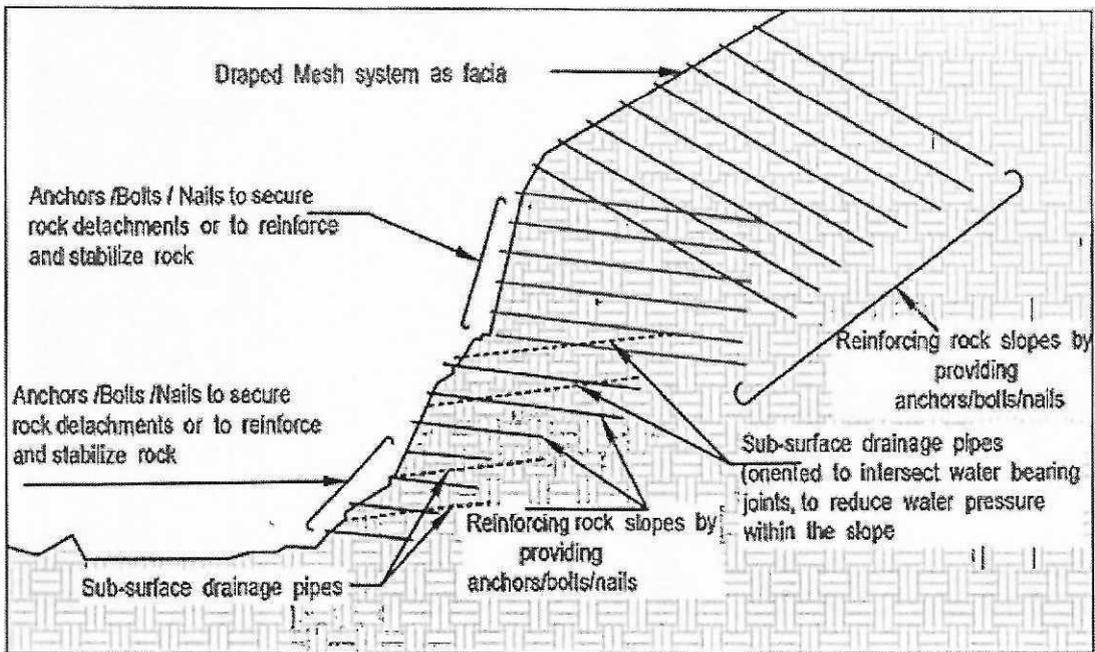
Typical Cross-section of Reinforcing Rock slope by Anchors/Bolts/Nails
